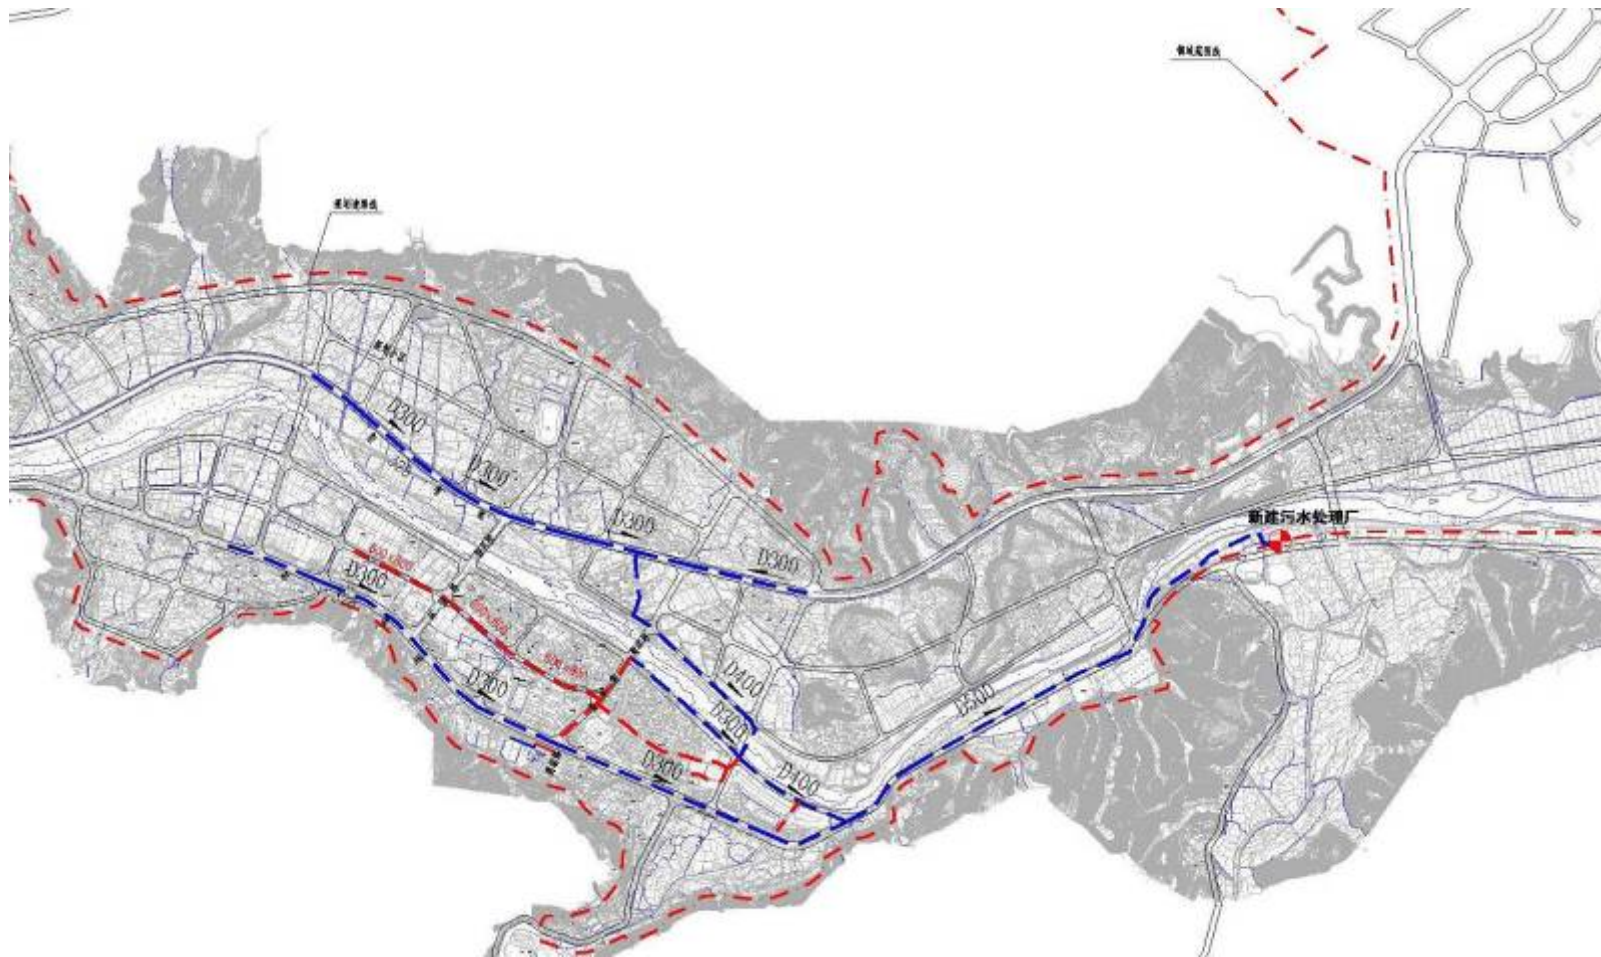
Layout Drawing of Sewage Pipe Network of Badu Town, Longquan City
